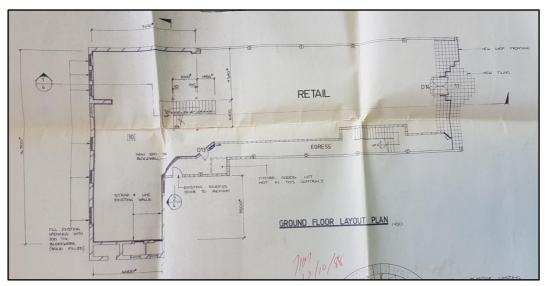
Detail from 1988 plan, showing the alterations to the floor plan of 36 Tay Street (Royds Garden, 1988).
